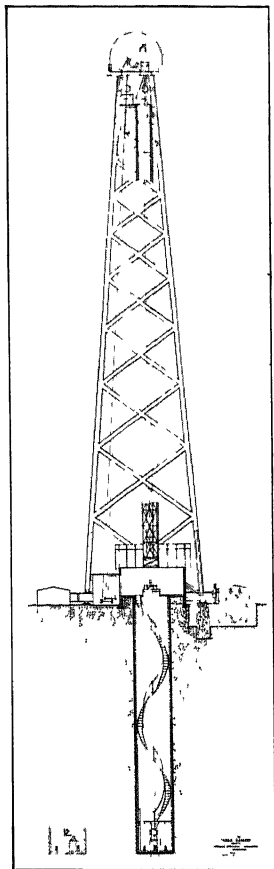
The 150-foot tower telescope of the Mount Wilson Observatory
